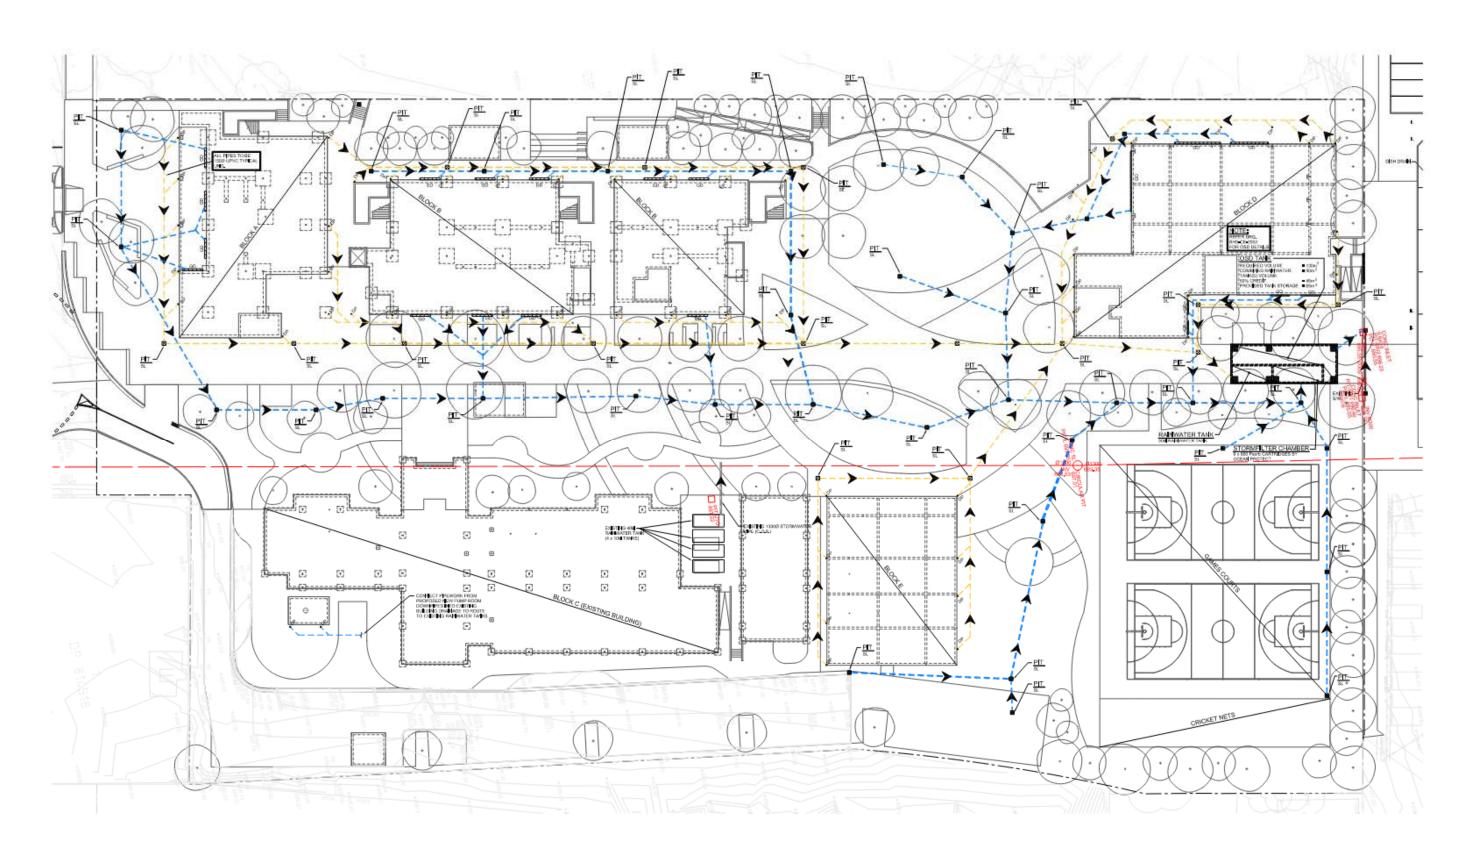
High School Site Stormwater Drainage Plan - REFER APPENDIX B FOR FULL DRAWING(S)
